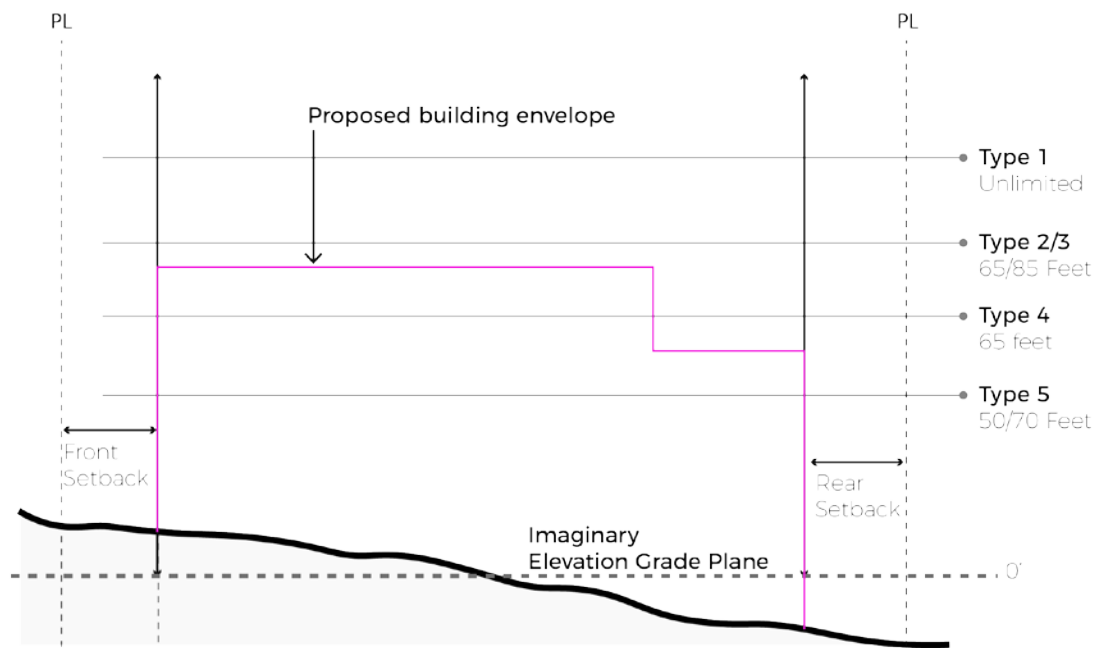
California Building Code Height Measurement Purpose. A proposed project on this site would be overlaid on this diagram to determine the allowed construction type per the CBC standards.
